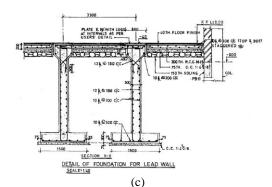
Foundation details as per drawing no. IGCAR/RML/0202/REV1
